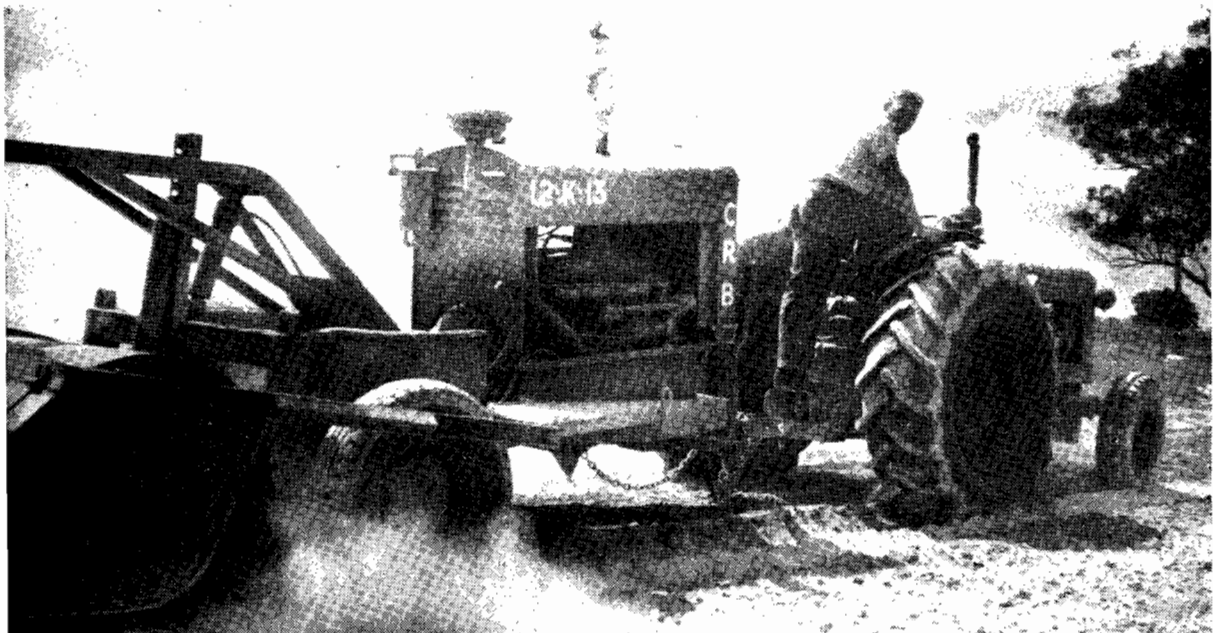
Murray Valley Highway, Section 2, 132.46 to 138.88 miles. "Seamen" pulverizer being used for final mix.
